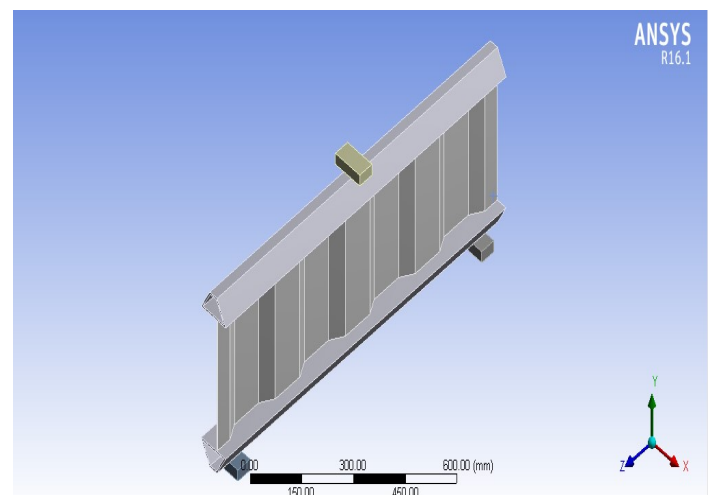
Plate girder with inverted trapezoidal hollow flange
